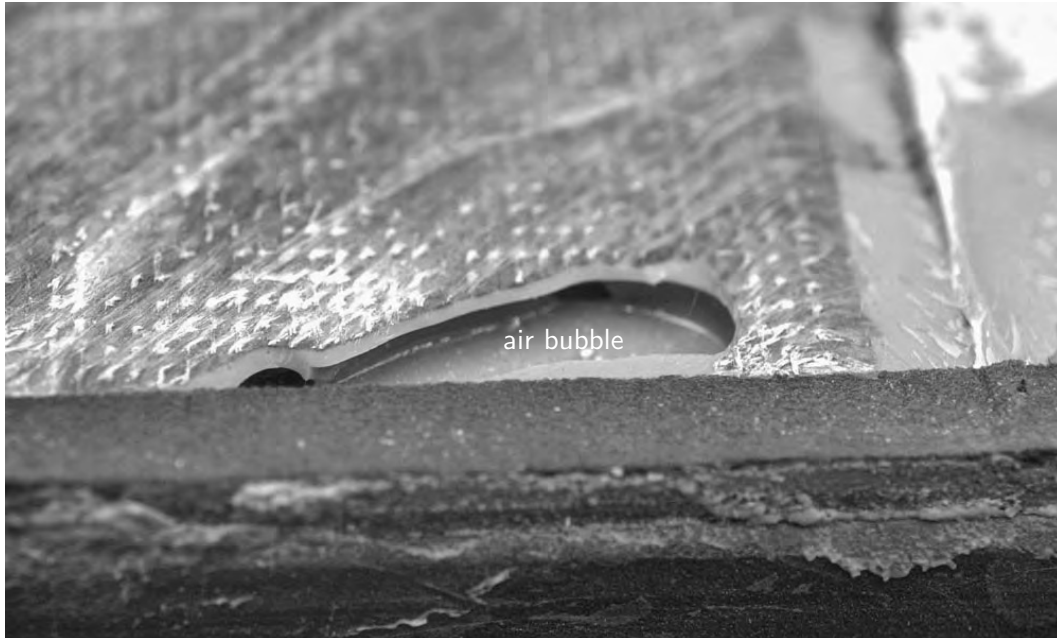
Air bubble near edge of failed adhesive connection on steel girder (C2-1)
